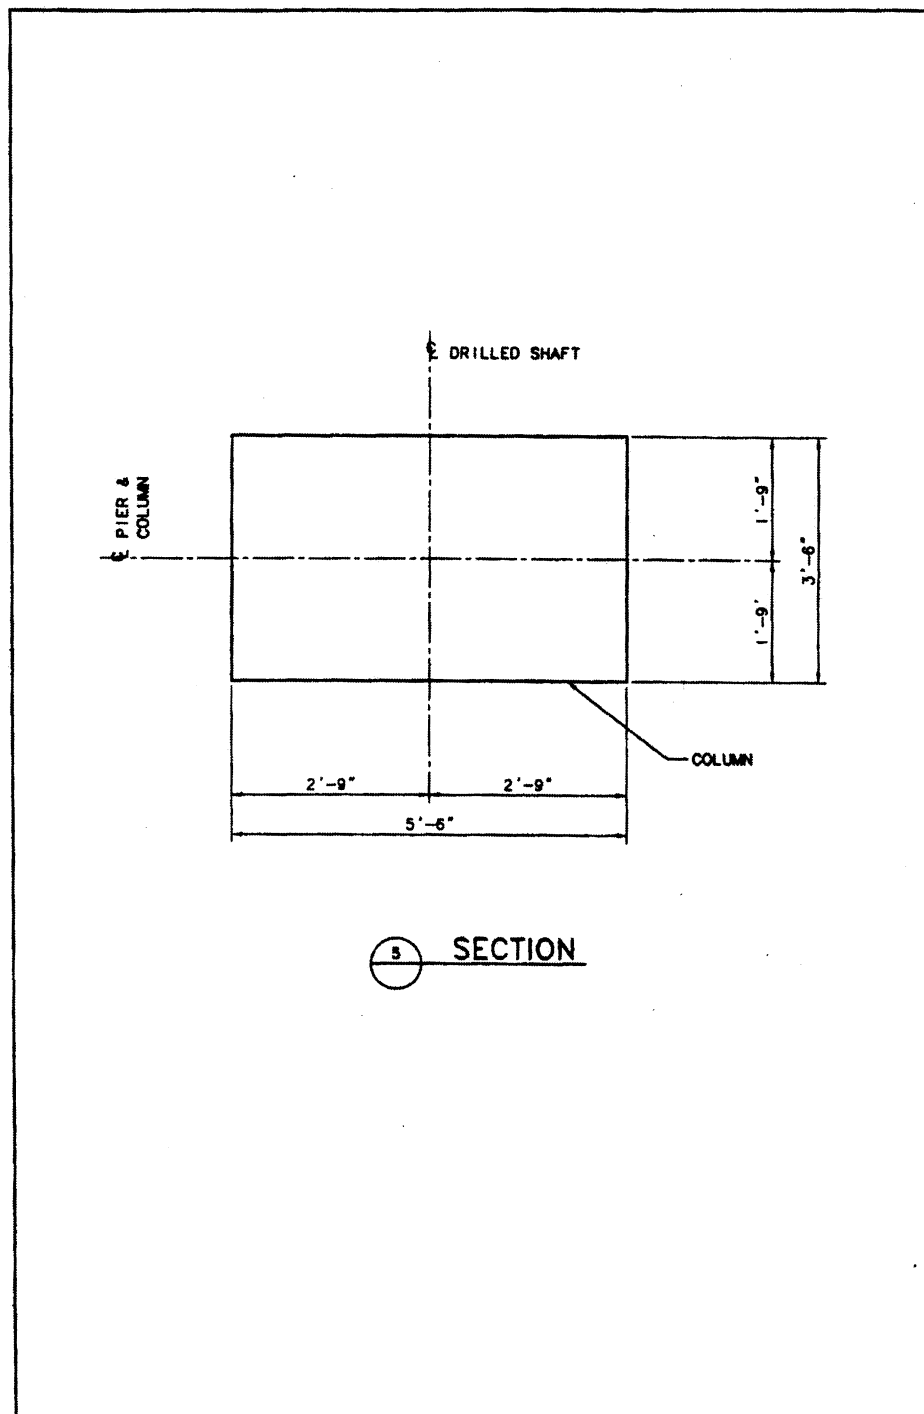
Bridge No. 6 – Horizontal Section Through Column
